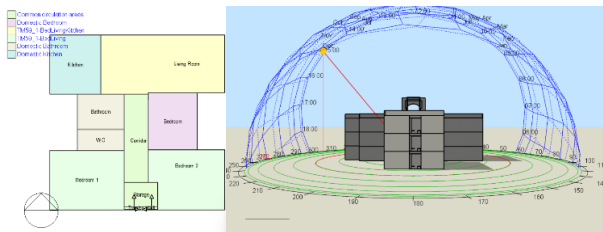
a) Mater plan, b) South façade showing the location of the Trombe wall
